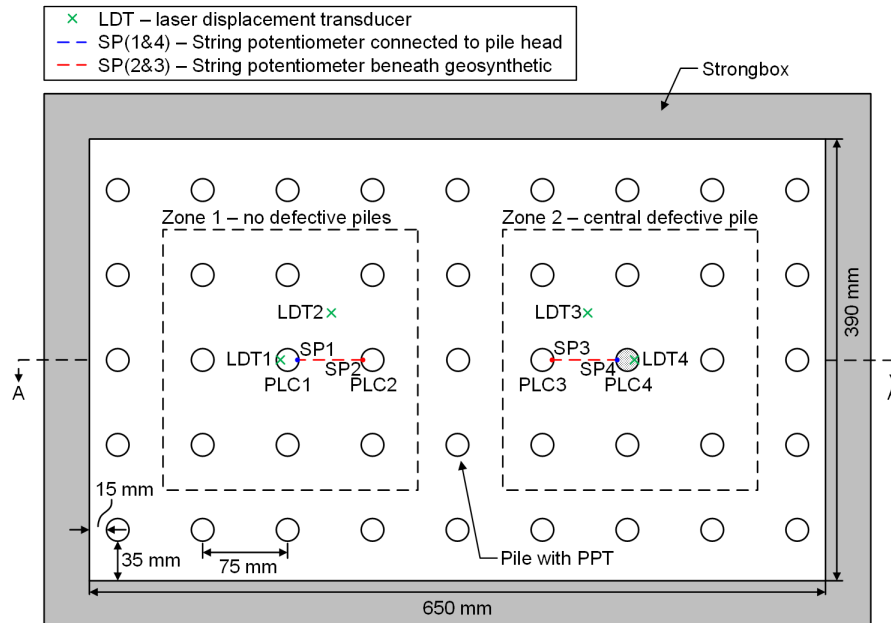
Plan view of the pile layout and instrumentation for both Model 1 and 2.
